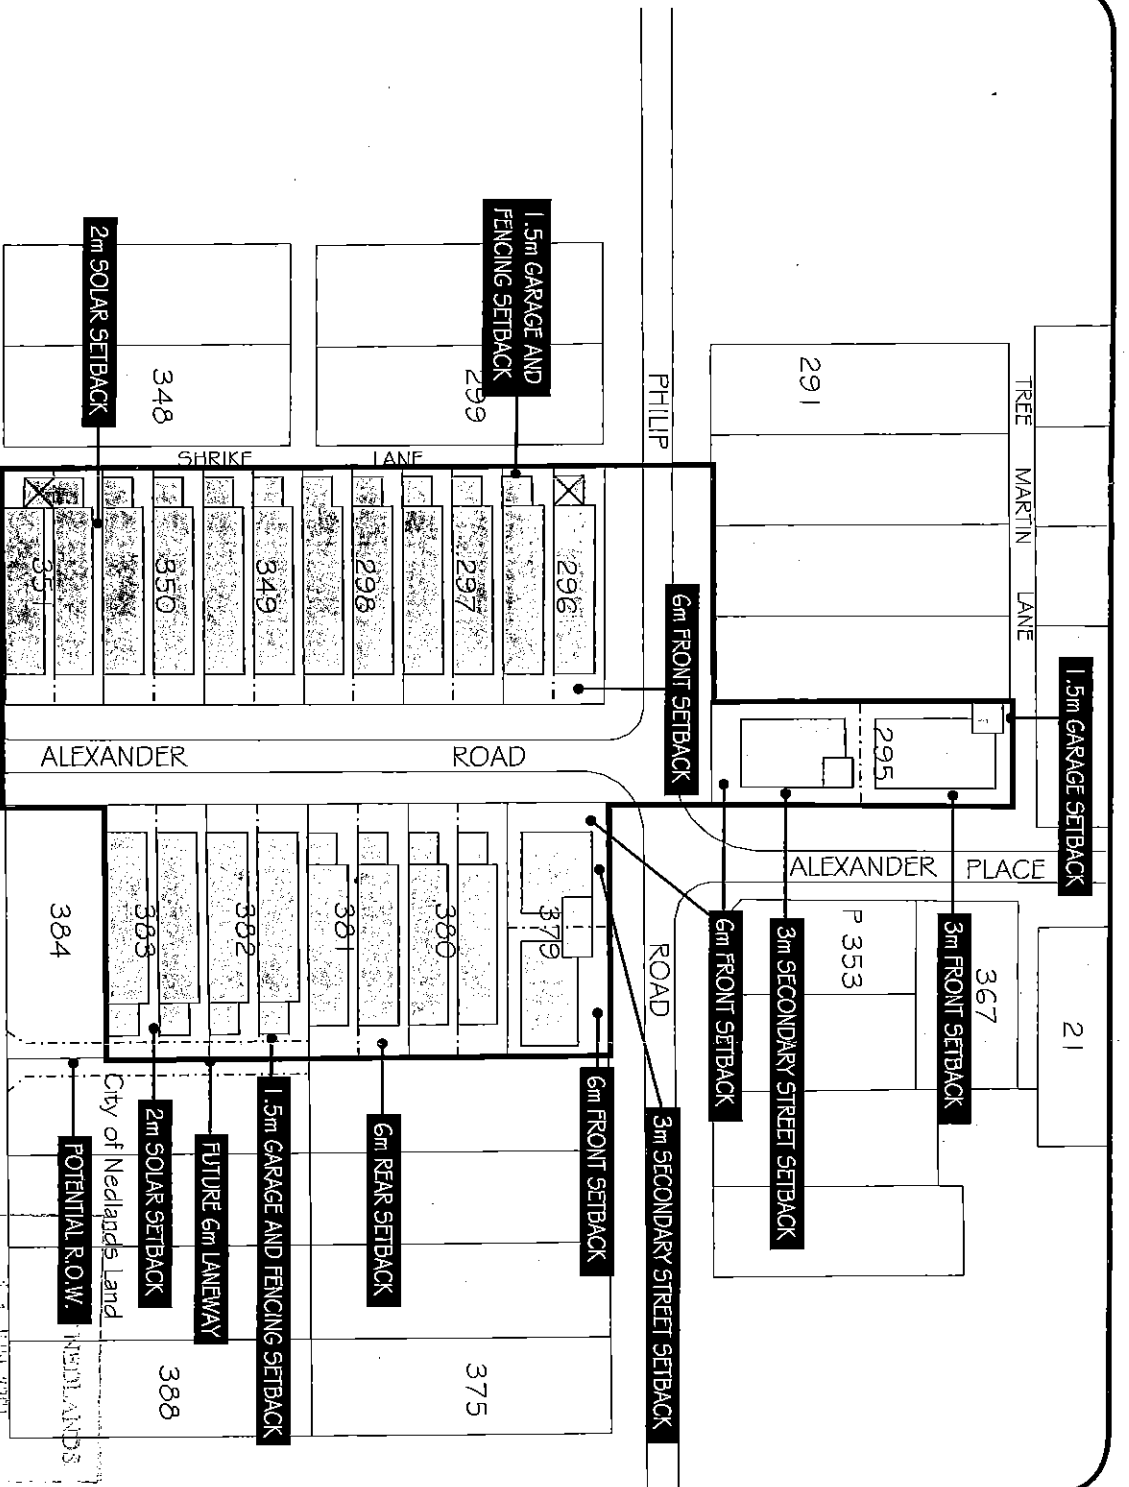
## DETAILED AREA PLAN PROVISIONS AND R-CODE VARIATIONS
